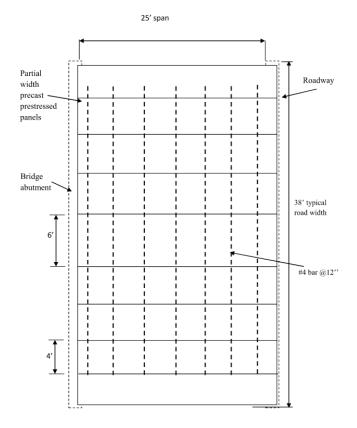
Plan view of precast approach slab panels (Gudimetla, 2012)
